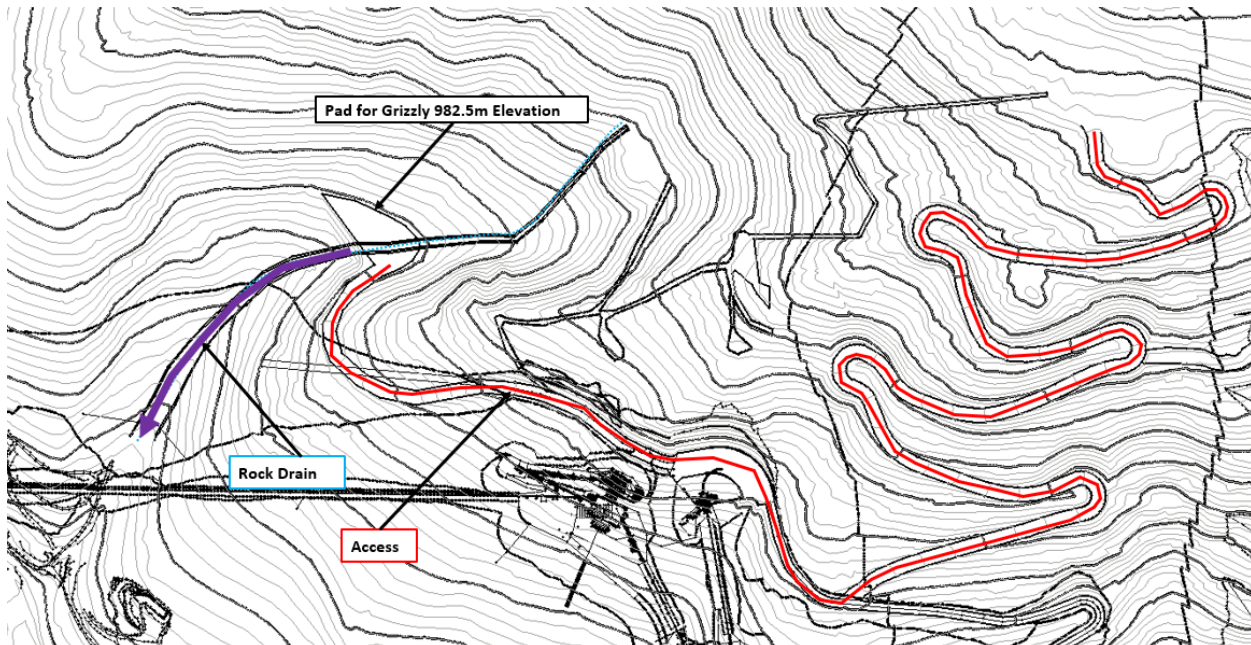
Eagle Pup WRSA Rock Drain Construction Phase 1 - 982.5 masl Elevation
